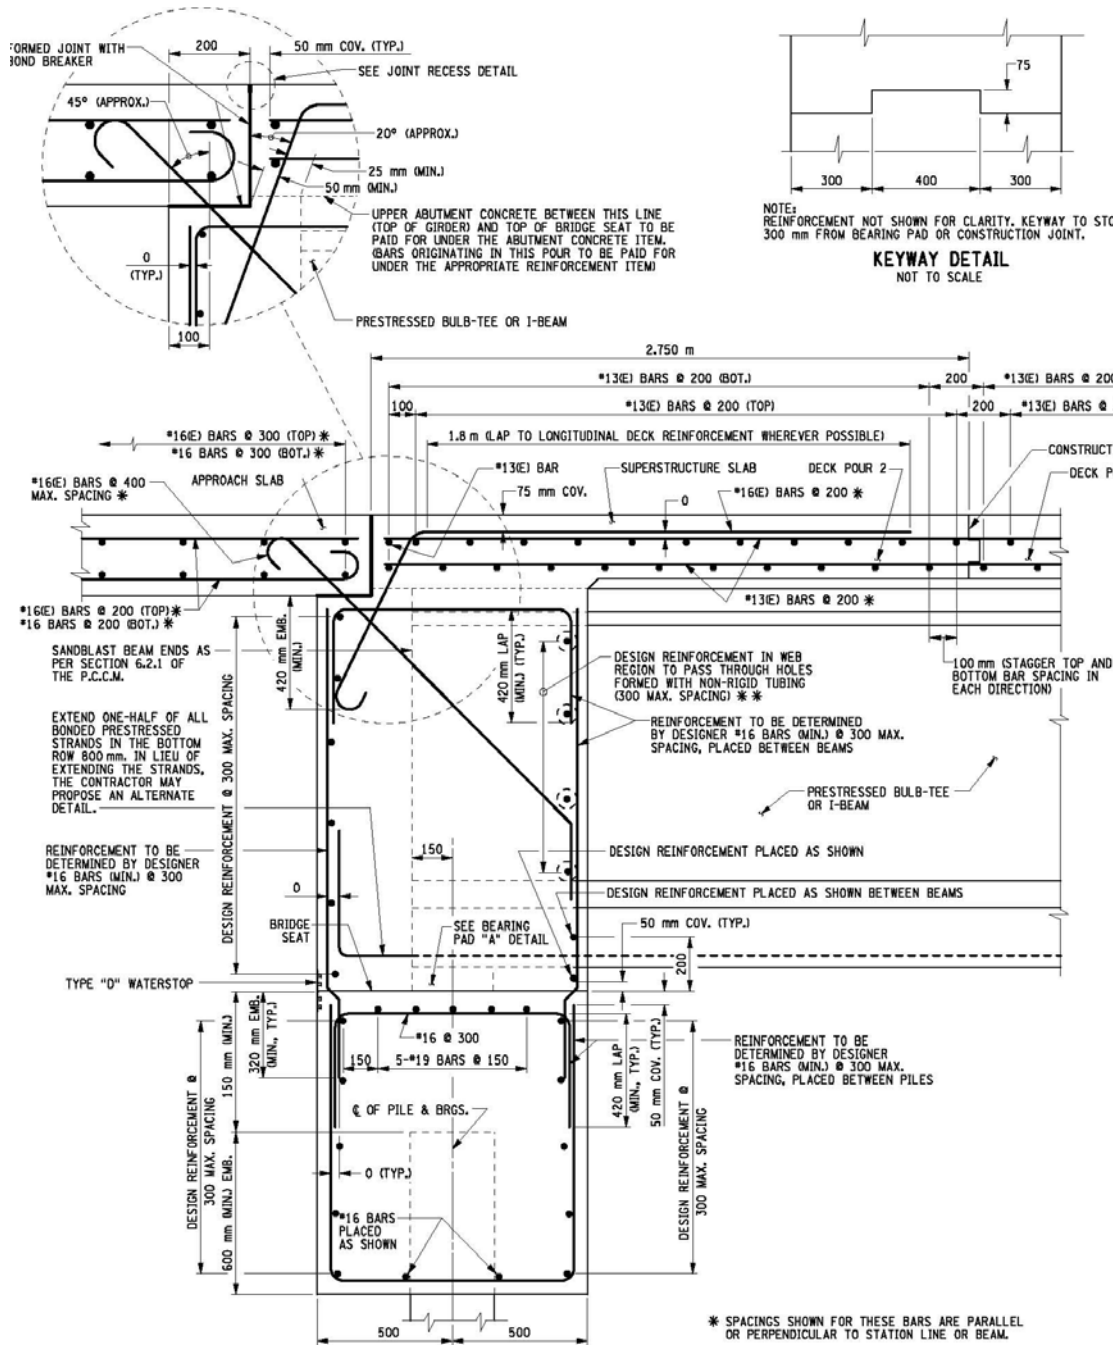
Current NYSDOT Integral Abutment Details for Precast Prestressed Concrete Superstructure
